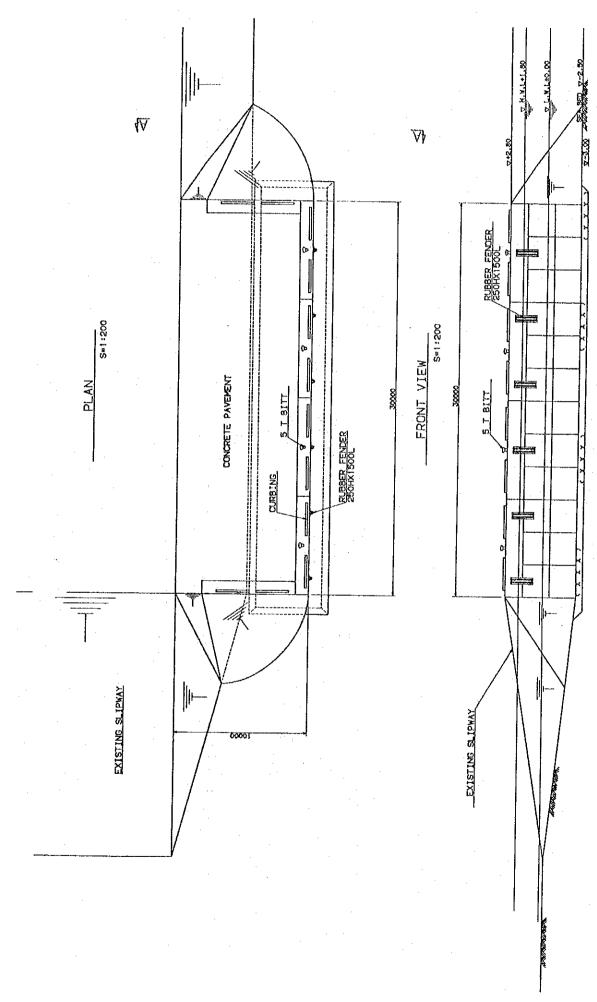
Fitting-out Quay (1), Plan & Front View
